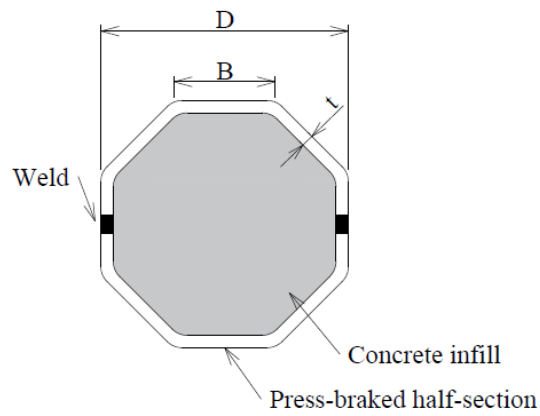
Concrete-filled CFHSS Octagonal tubular stub column cross-section.
